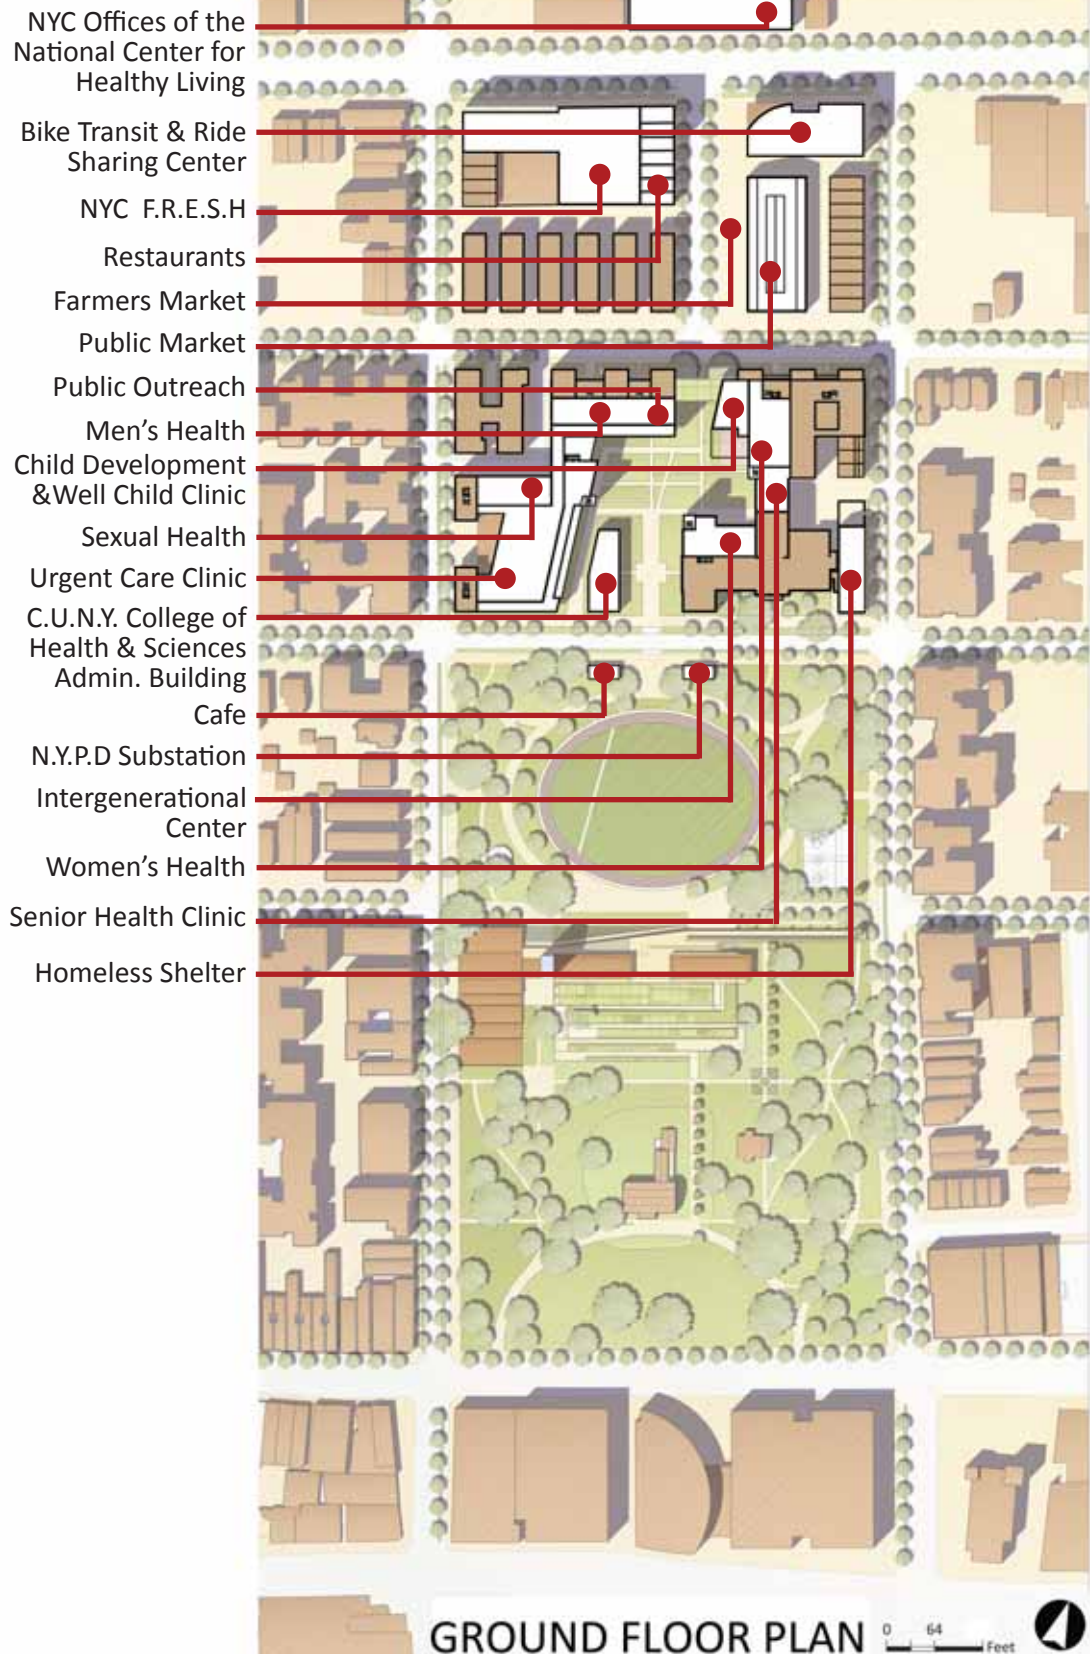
Ground floor plan of urban design development showing location of publicly accessible health amenities
